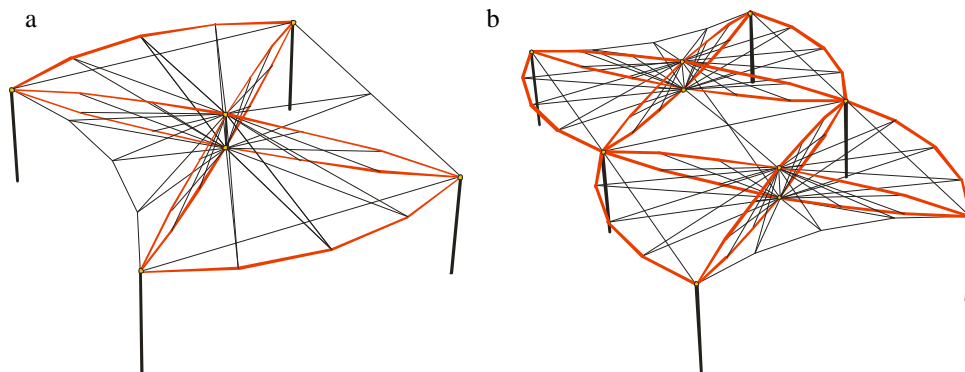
a) Scheme of single segment, b) general view of two segments of roof structure of a coupler located between stands and technical building of the sport stadium
